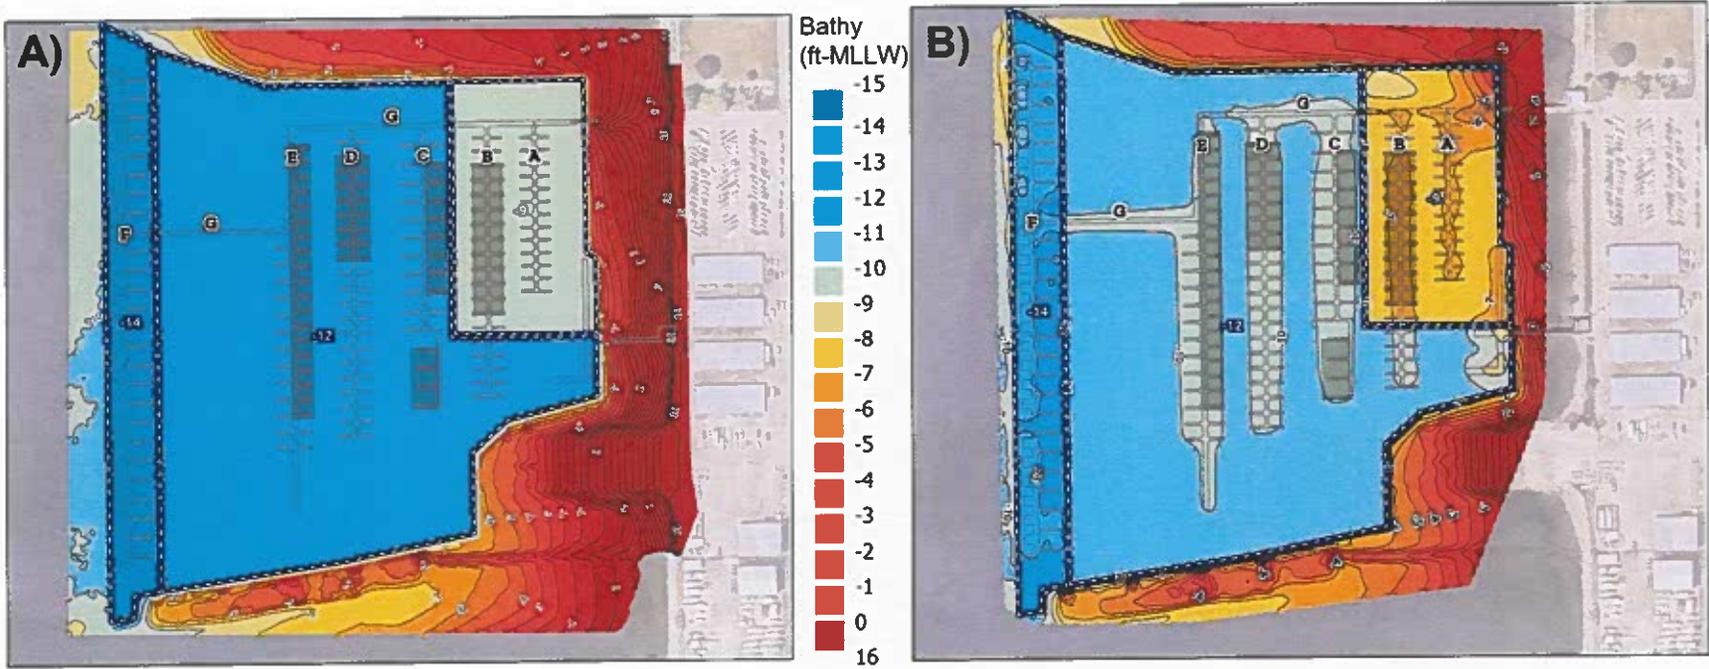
Alternative 1 Dredge Plan (A) and Dredge Plan Aged 10 Years (B)
